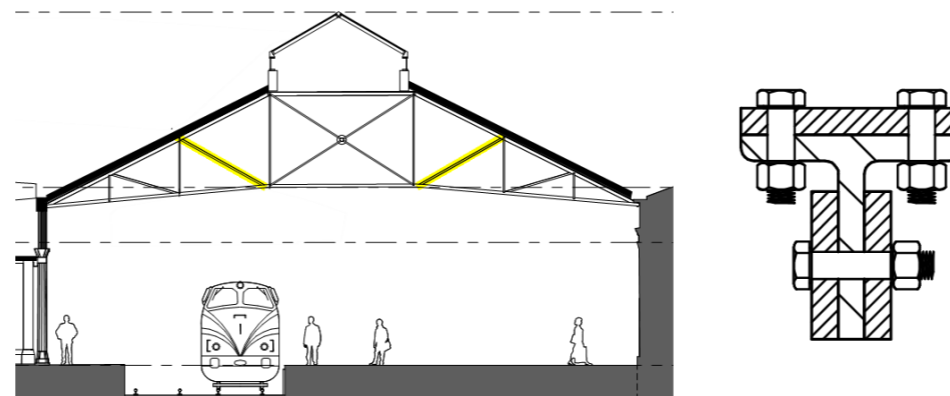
Strengthening detail to diagonal elements
